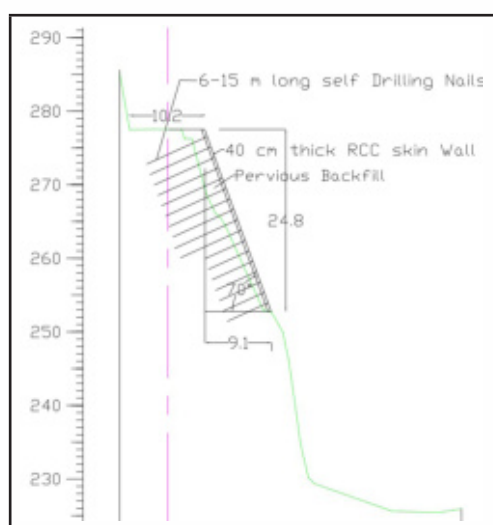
Final design of the slope with rock anchors (38 mm dia. self-driving) at 1.5m spacings on both sides with about 40 cm thick RCC facing wall of about 25 m height.
